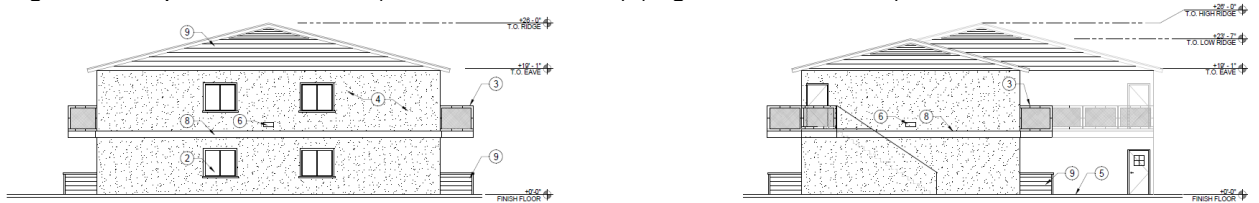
Figure E. Proposed Elevations (Top, Roeser Road Frontage) (Bottom, North Elevation)
